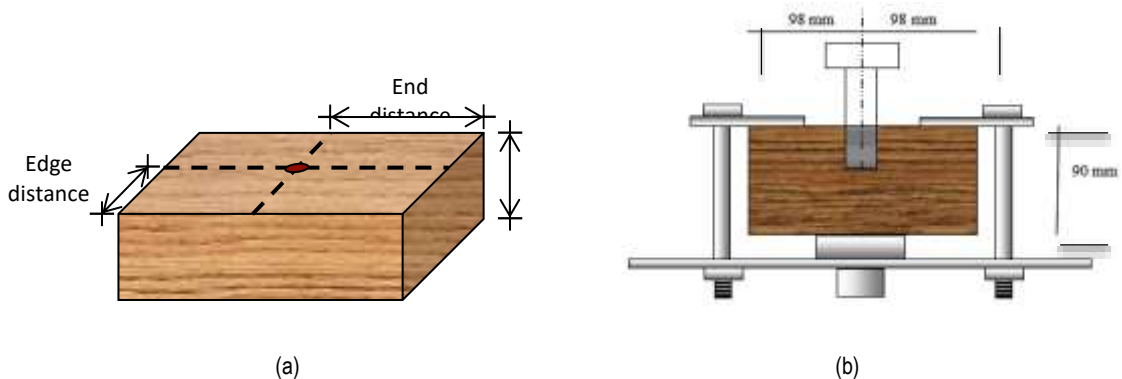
Configuration of spacing and bolt insertion: (a) position of end and edge distance (b) minimum dimensions and threaded bolt insertion in sample
